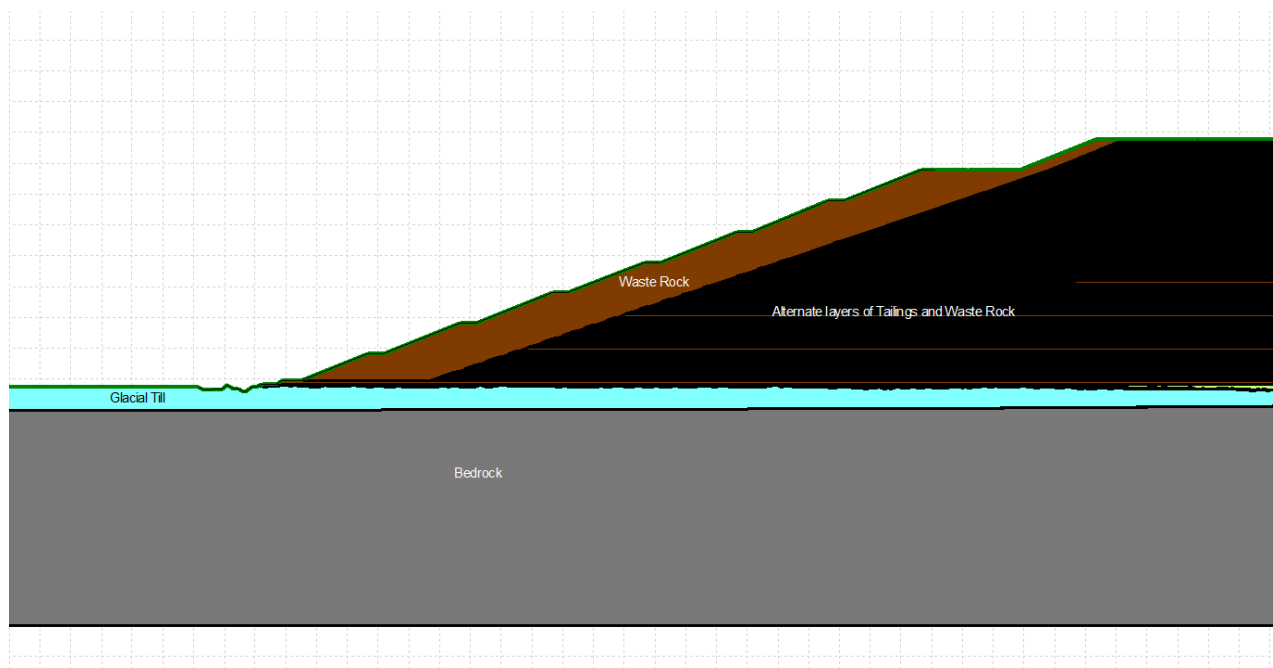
Cross Section of Co-Disposal Facility Along Section A-A West Looking North
